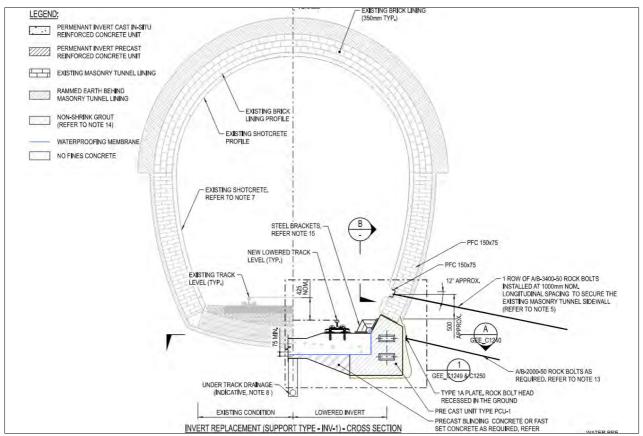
TYPICAL CROSS SECTION OF TUNNEL SHOWING INVERT REPLACEMENT TYPE INV-1 IN VOLCANICS AREA. (SOURCE: AURECON/VLINE) NOTE FOR PFC INSTALLATION AND ROCK BOLT SUPPORT TO TUNNEL LINING REFER SECTION 3.1.4.
